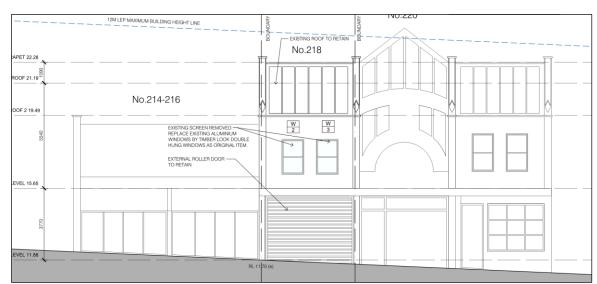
Proposed south elevation (source: Vivi building design, dated 13/12/2024)
